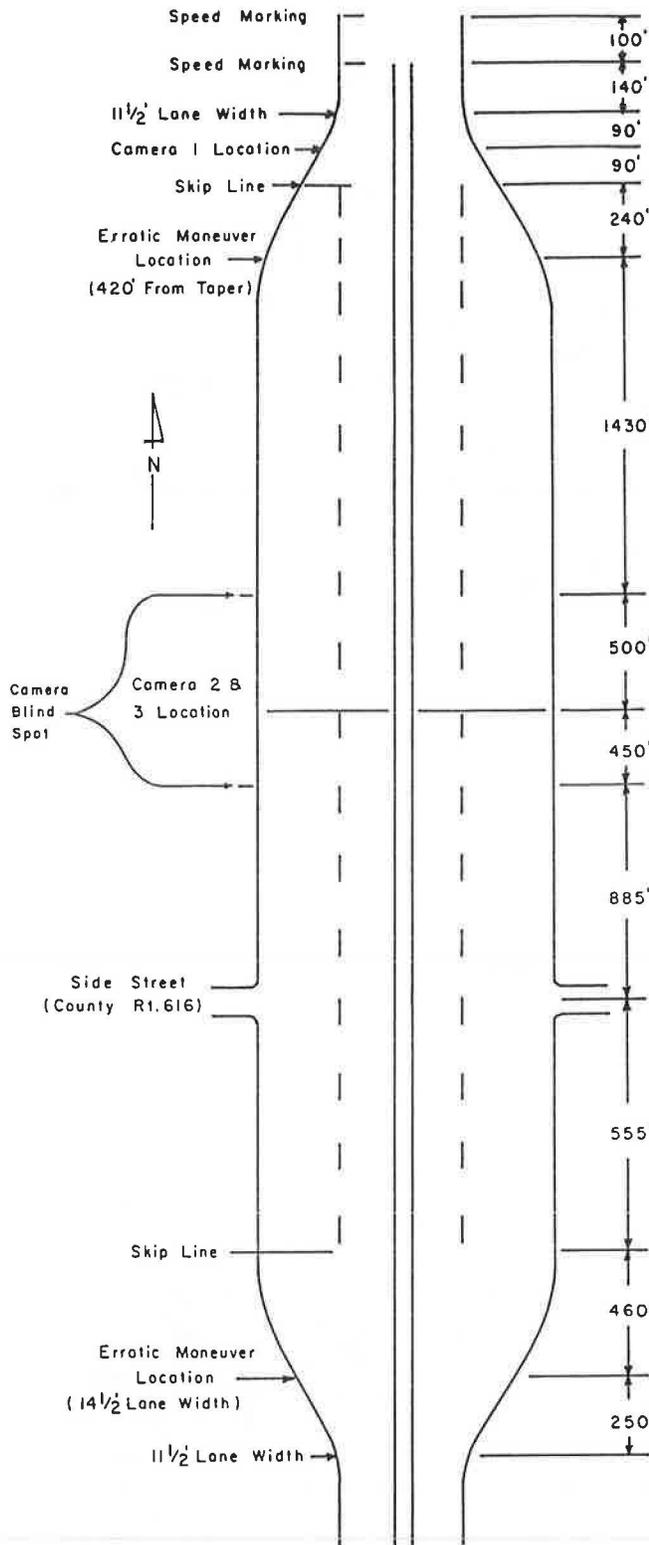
Rt. 206 test site; data collection location (not to scale).
